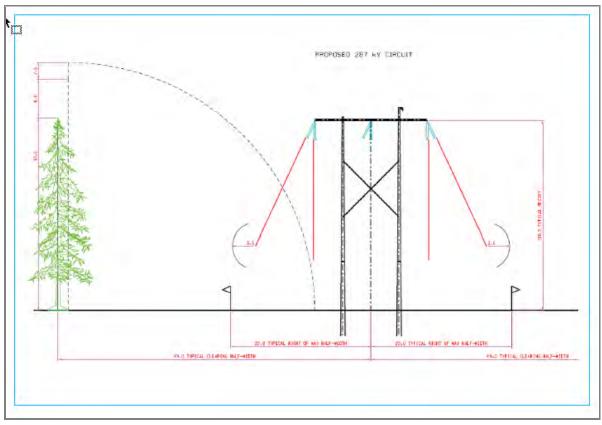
Typical H-Frame and ROW Cross Section
